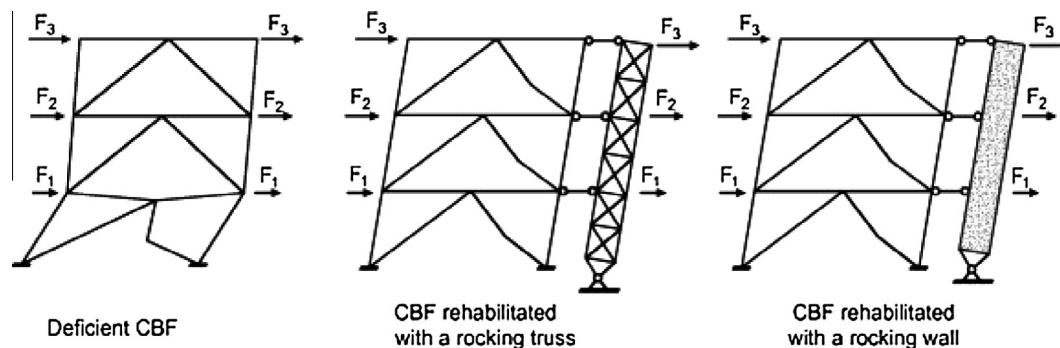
Schematic of sub-standard braced frame and stiff rocking core (Qu et al. [3]).
